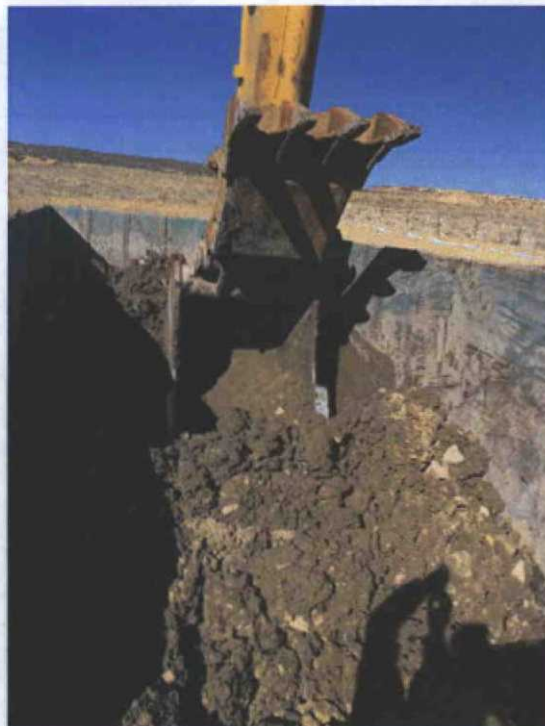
Mixing the drill cuttings with clean soil from trench excavation. Stabilization was achieved at a ratio of 1 (clean): 1 (cuttings).
